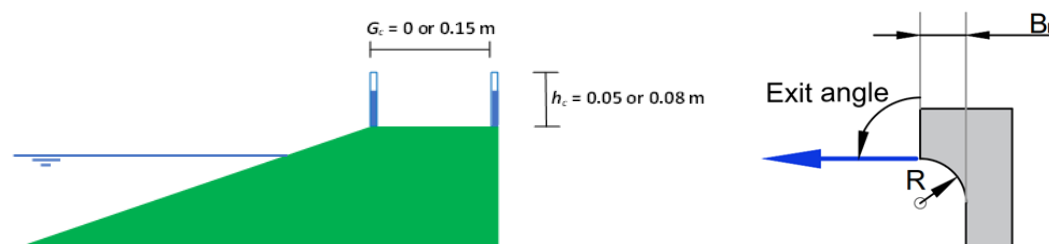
Left panel: Details of crest wall configurations; Right panel: Recurved parapet.
